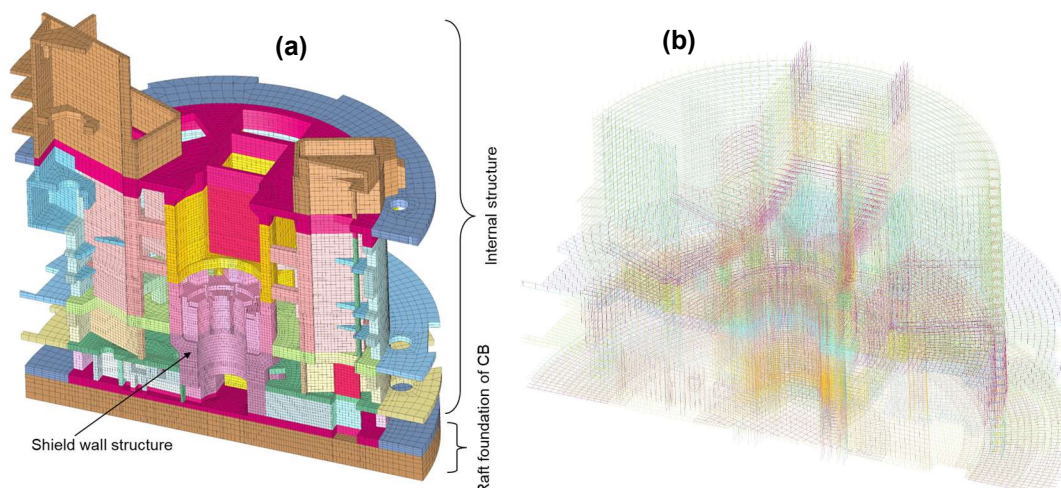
numerical mock-up of the internal structure viewed in cross section, (a) concrete, (b) rebar
